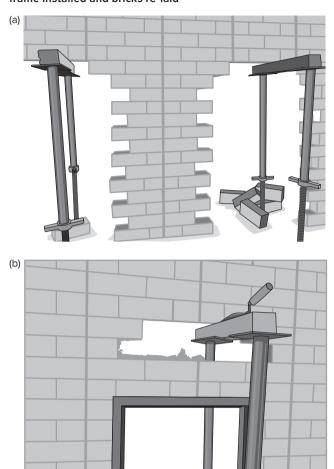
(a) Brickwork removed and toothed; (b) door frame installed and bricks re-laid
